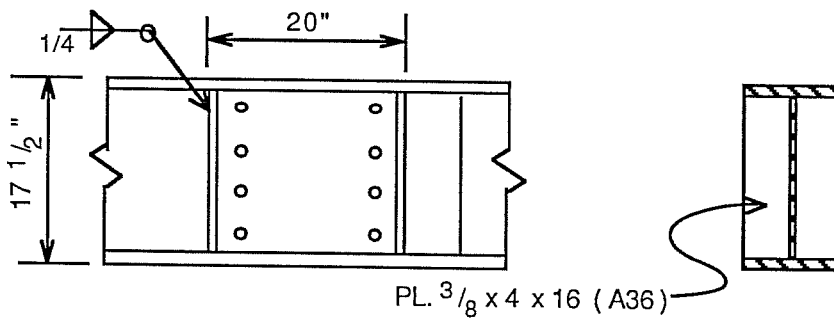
Typical Reinforcing Steel Detail (Specimens 3 to 9)
